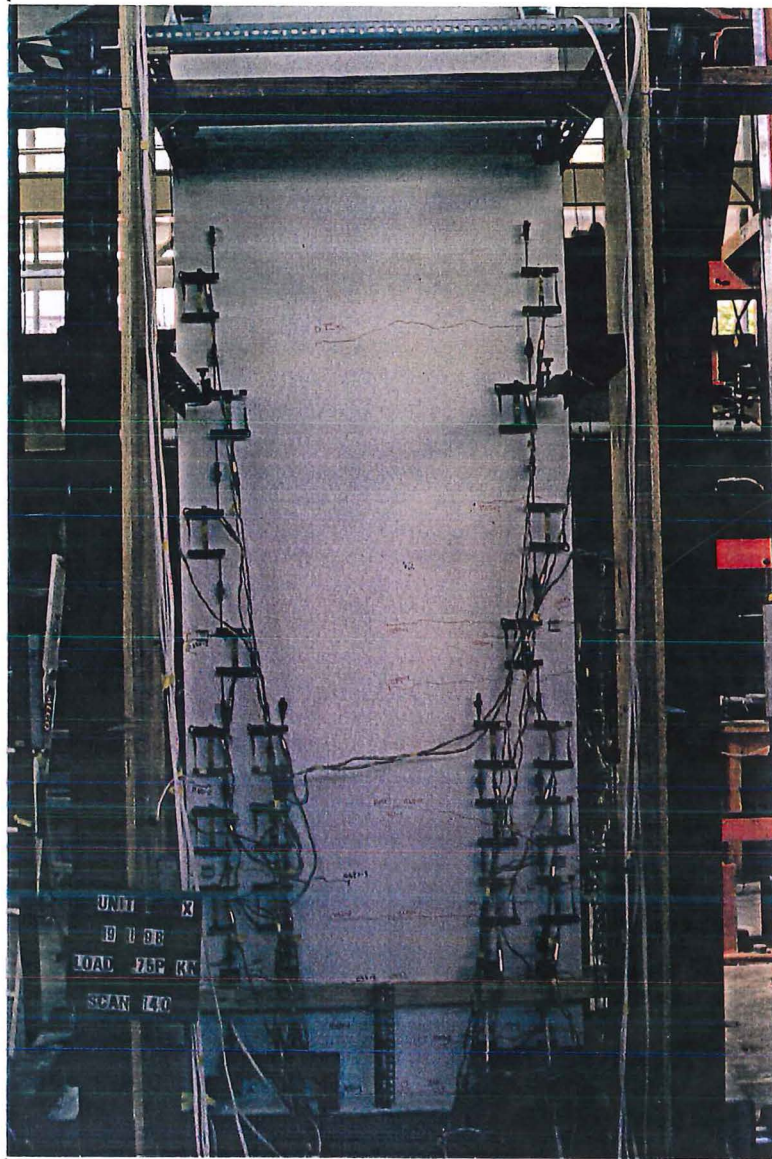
View of Unit 1: At cracking strength (South/Concave)
